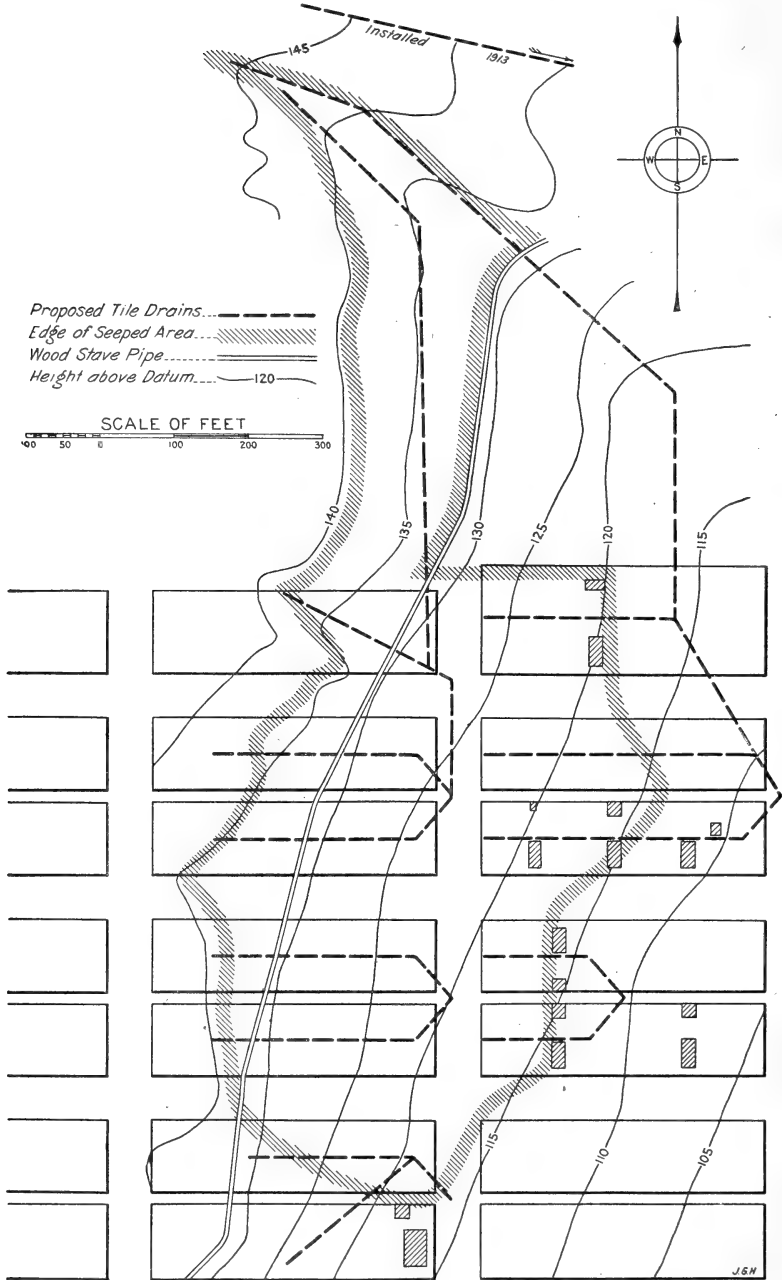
Tract near Canon City, Colo., showing proposed plan of drainage.
